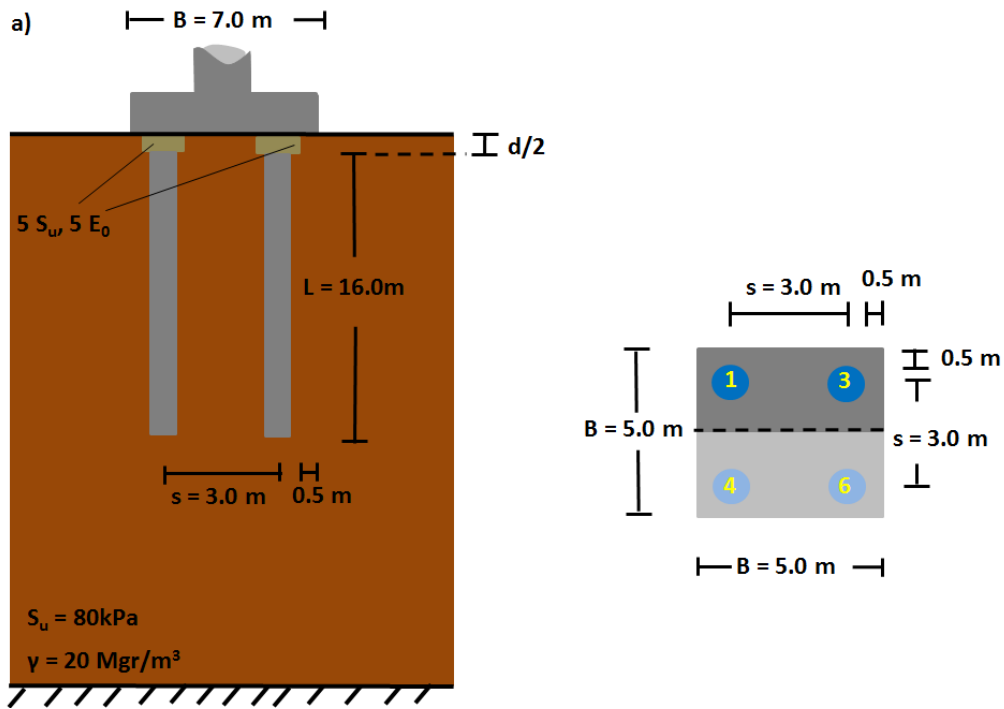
Final design of the rocking foundation (UR). Section and plan view.
